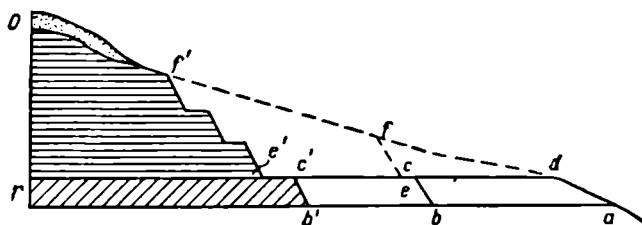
Open-pit layout on a flat bed with sloping ground surface
